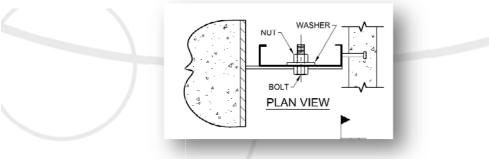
Modified Precast Structural Connection Detail (<u>www.slenderwall.com</u>)
